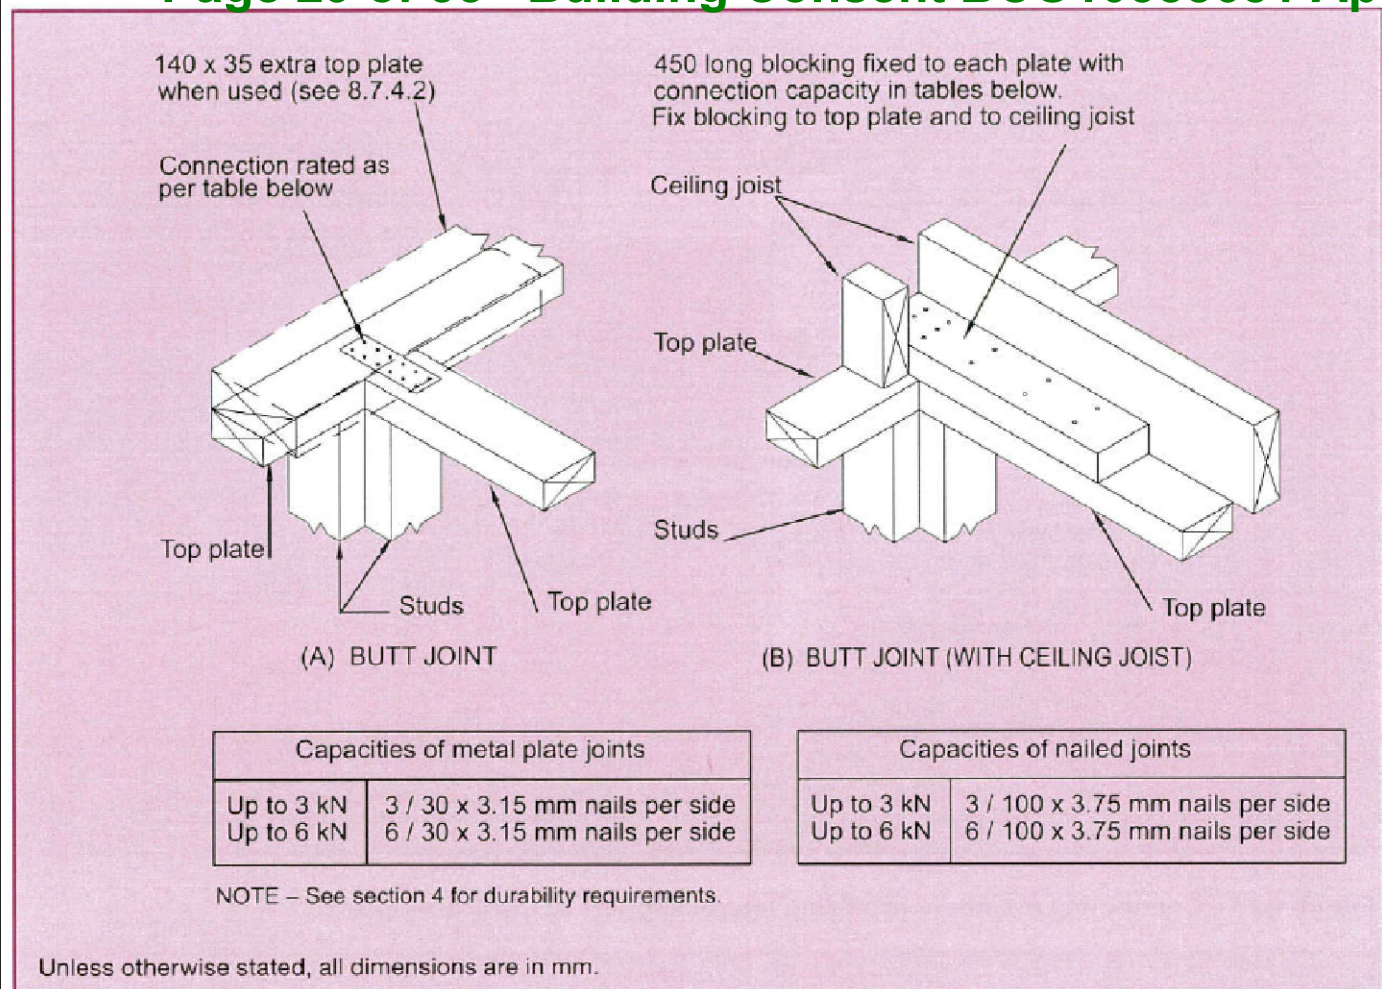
Connecting top plates to external walls at right angles – Walls containing bracing (see 8.7.3.4)
